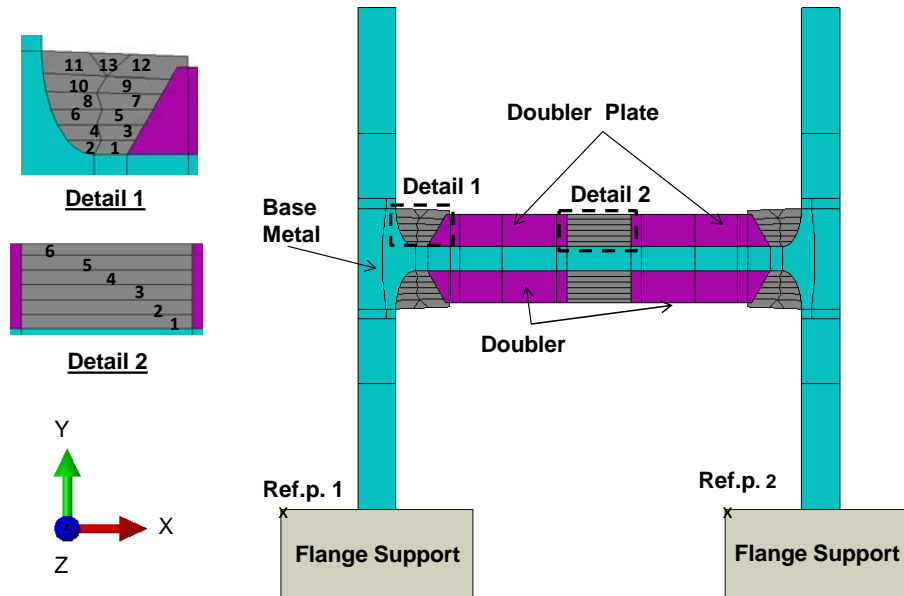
2D model geometry of the welded column assembly (Cross-section A-A)
